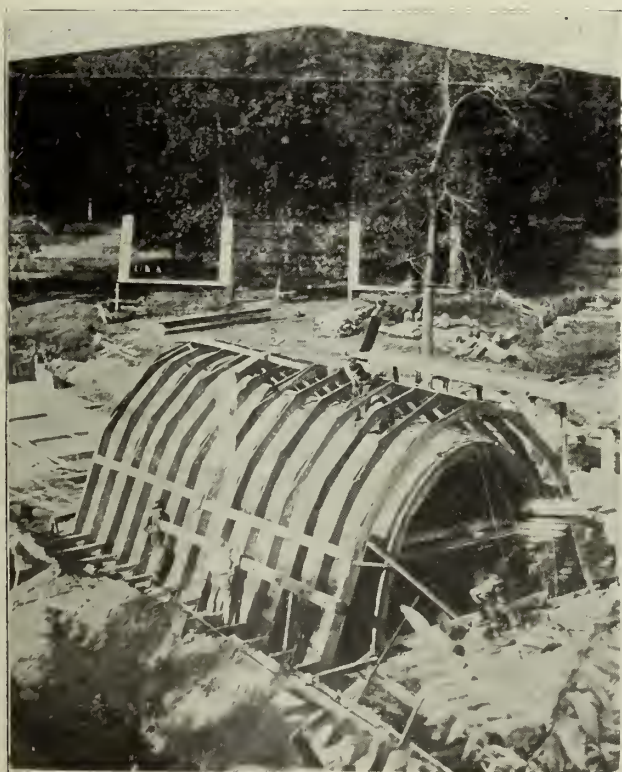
Trestle for Marshall Fill, $\frac{3}{4}$ Mile West of Madrid, Iowa.Fig. 14—Reinforced Concrete 16x12½-ft. Arch Culvert $\frac{3}{4}$ Mile West of Madrid, Iowa.
